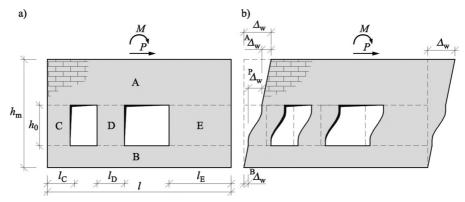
Total wall stiffness method: a) division of the wall with openings into component elements, b) wall deformations caused by horizontal loads
